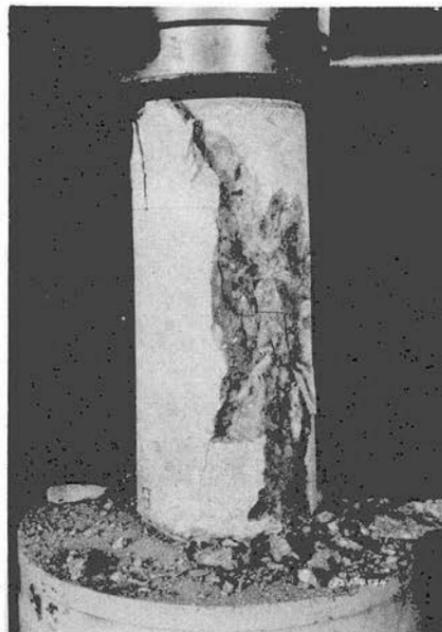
Core A-1 After Testing Showing Typical Fracture Where Specimen Failed Outside of Joint. Strength 4990.
